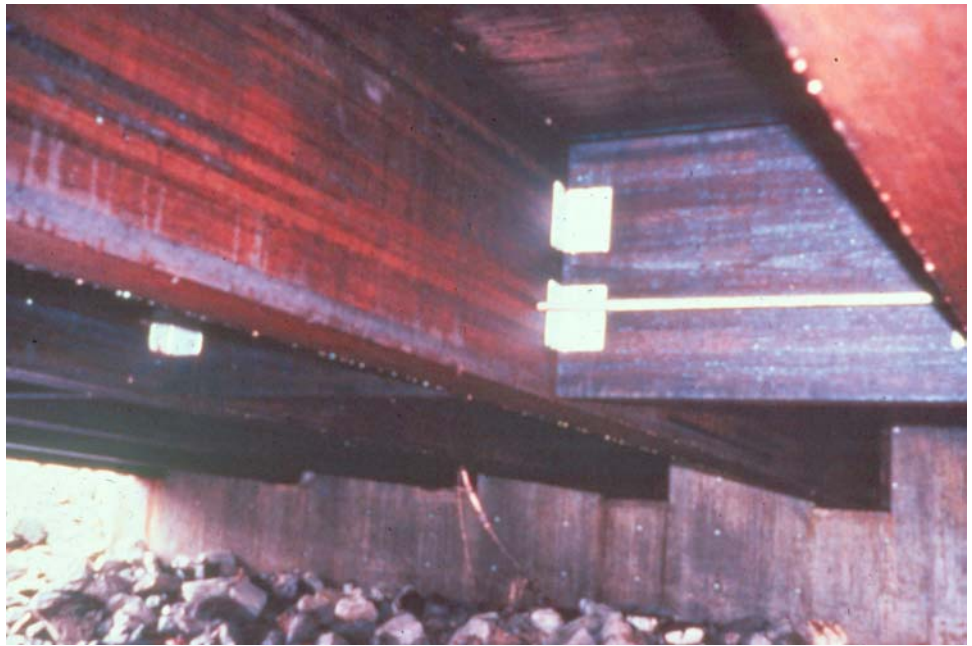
Underside View of Typical Glulam Multi-beam Bridge
